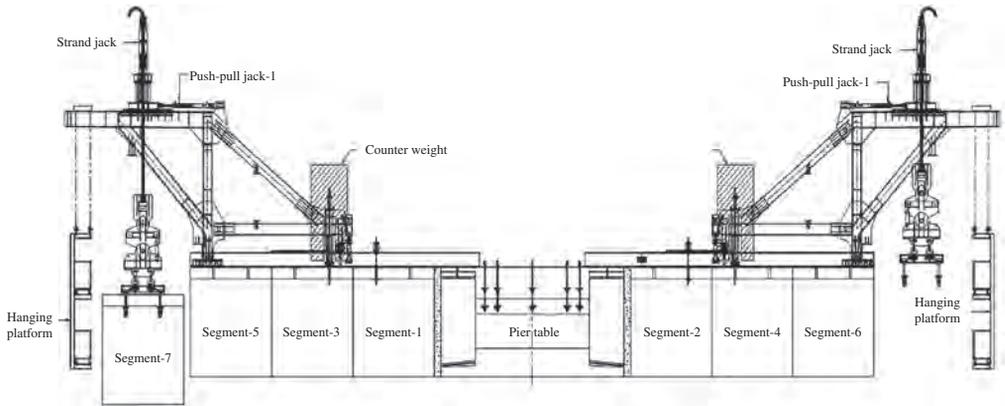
Erection of segment 7 (Extradosed Bridge across river Narmada)
